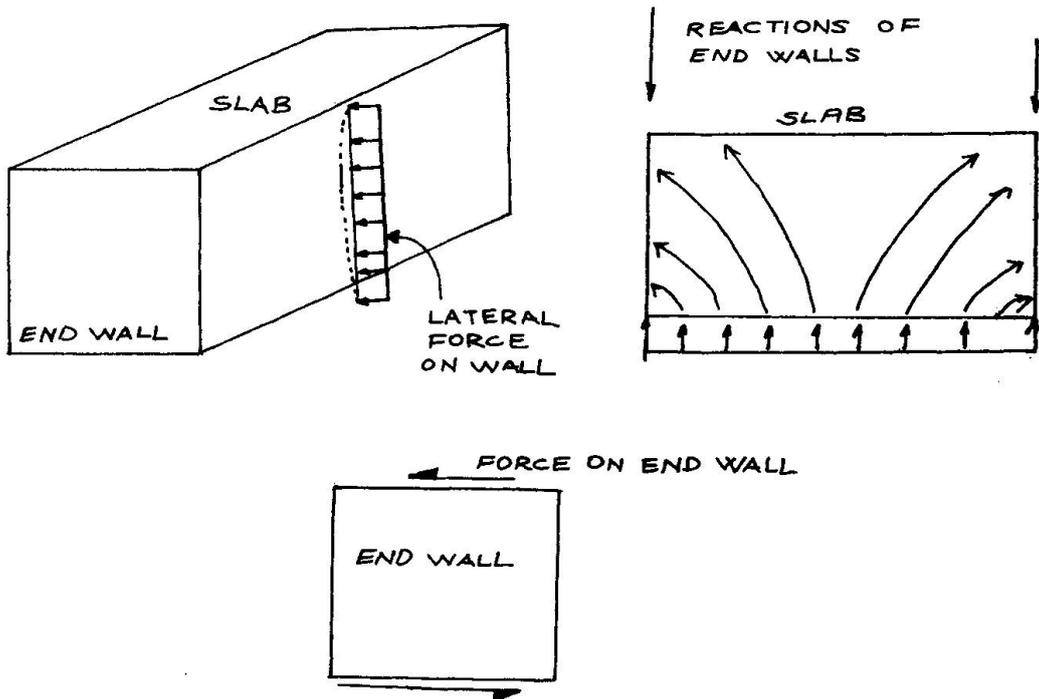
State of Loading on Brick Walls Due to Lateral Forces
